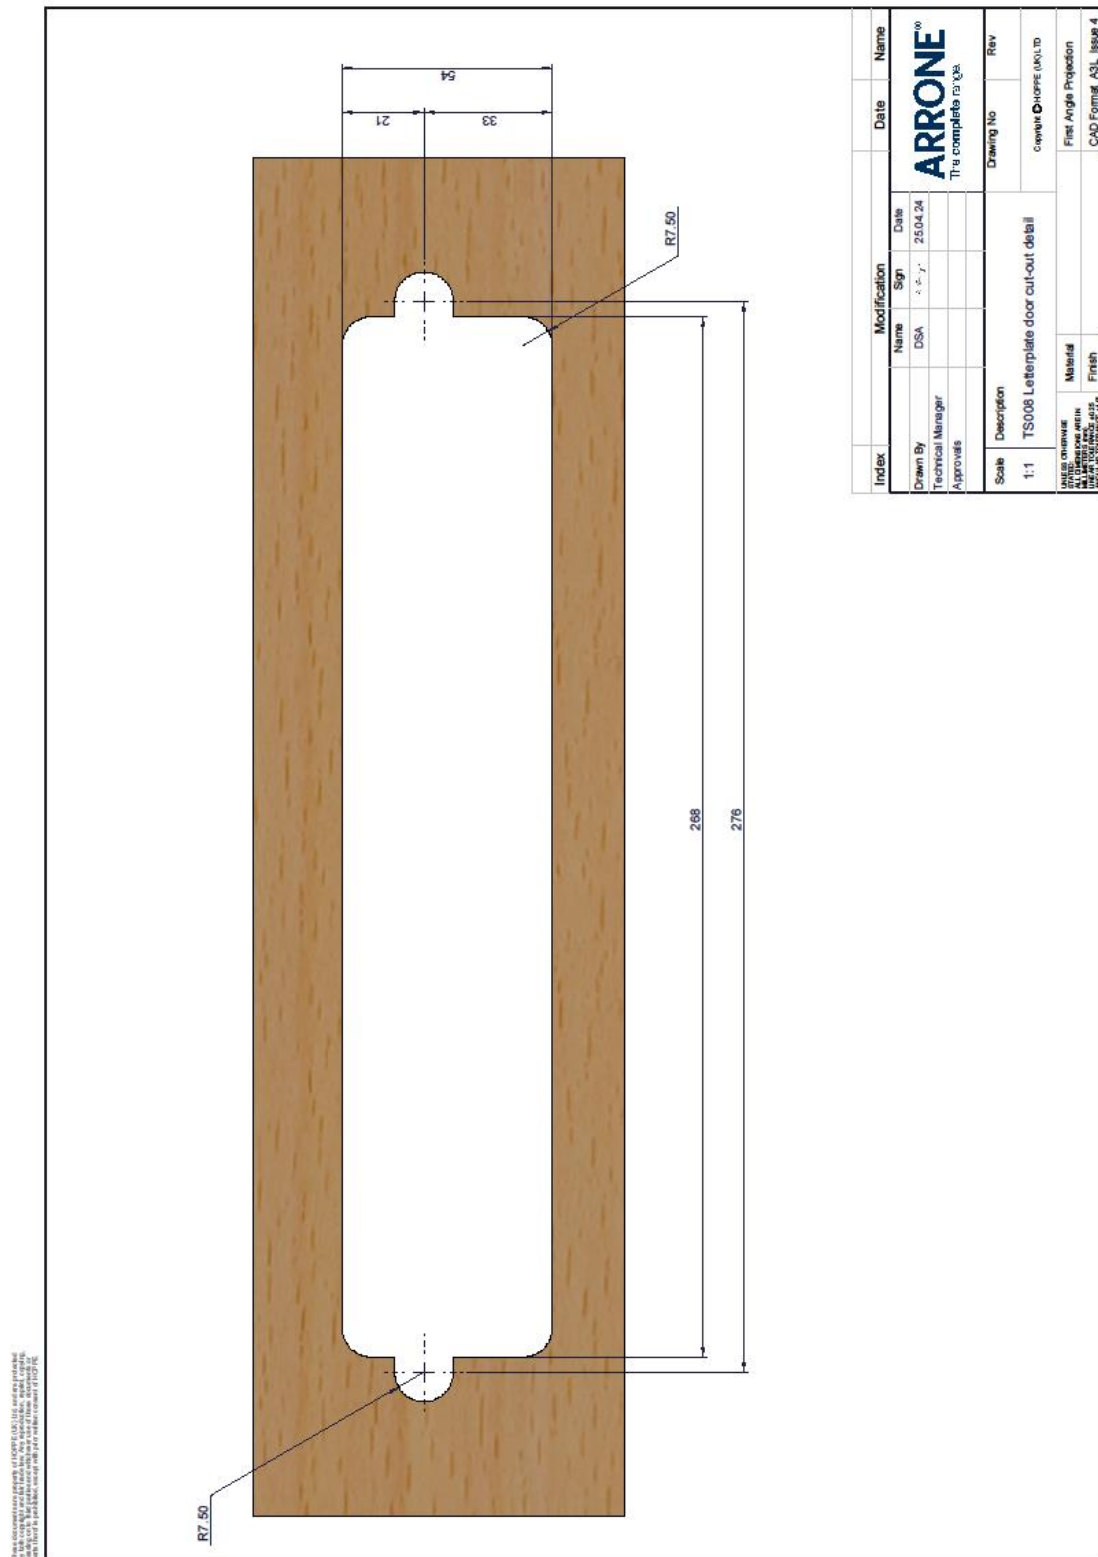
Client Inward Drawings – Details of Letterplate door leaf cut-out
